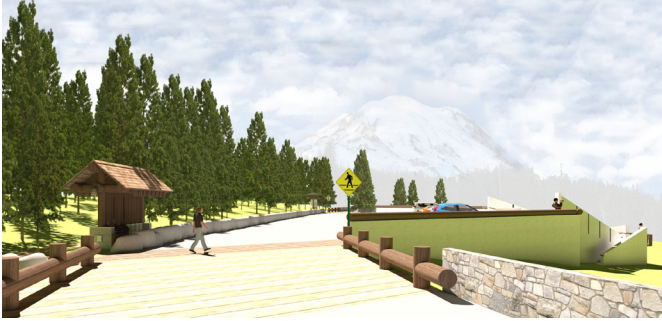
view toward Prospect Point and trailhead pavilion, from bridge, looking west
